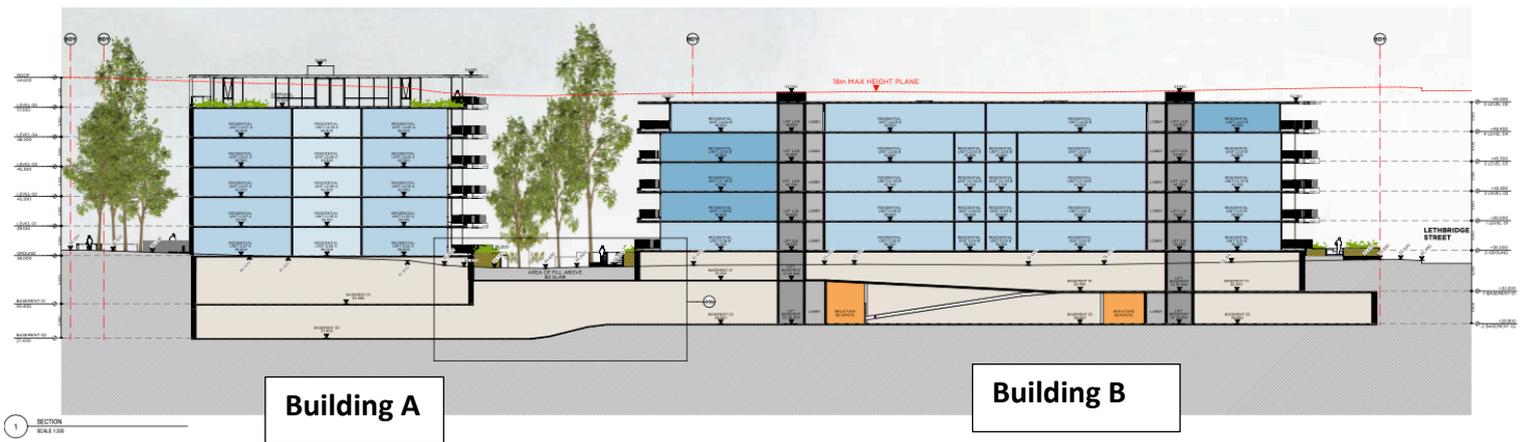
BUILDING HEIGHT PLANE -SECTION
